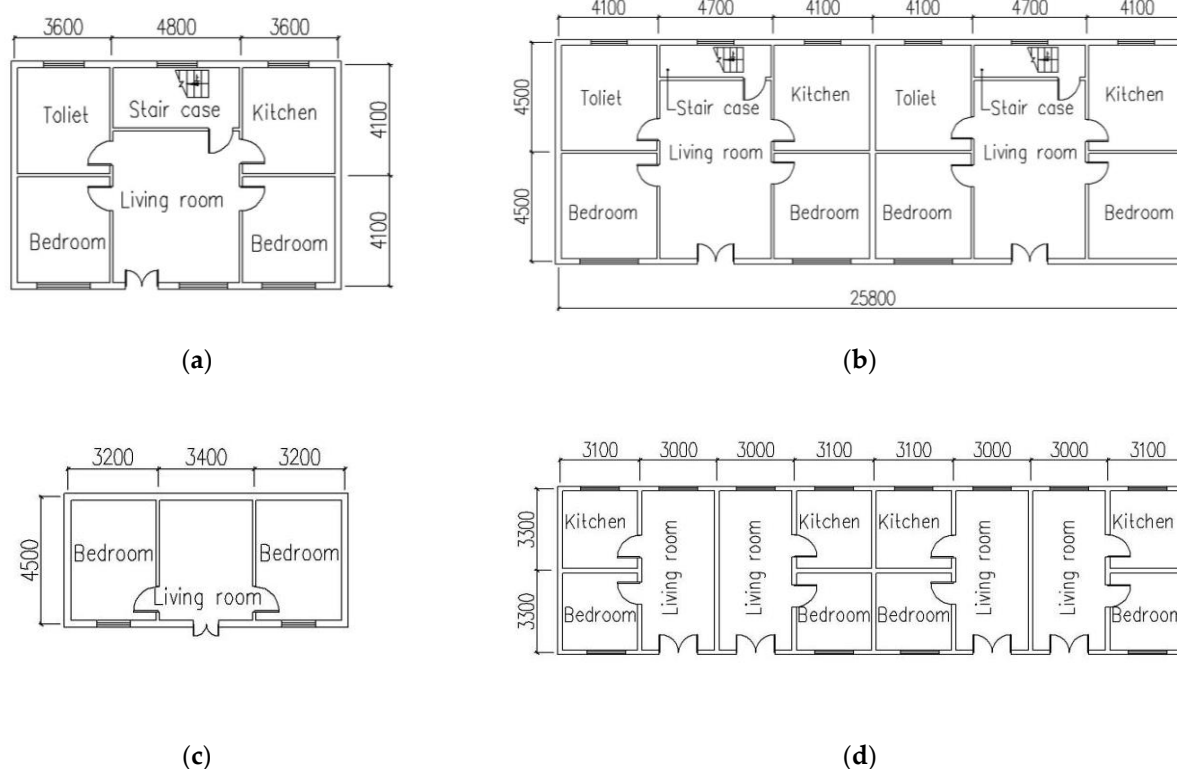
The architectural drawings of typical rural houses in mm: (a) two-story sloping roof rural house; (b) two-story flat roof rural house; (c) single-story sloping roof rural house; (d) two-story side-by-side building.
